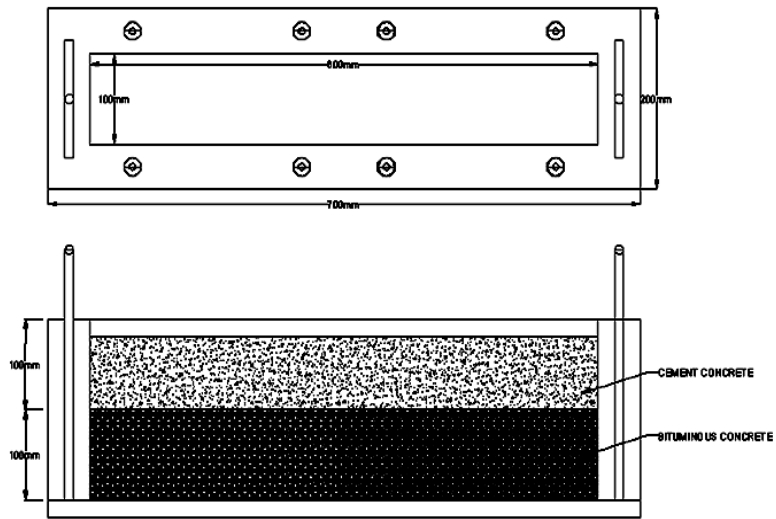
Dimensions of Rectangular Composite Beam Specimen
